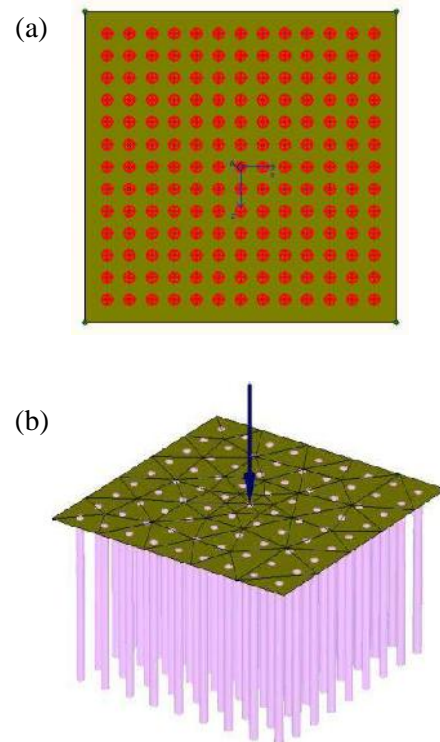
Model of SPR Foundation System with 7.0 m x 7.0 m Concrete Slab, (a) Plan with Pile Spacing of 0.50 m; (b) Upper View with Pile Spacing of 0.75 m.
